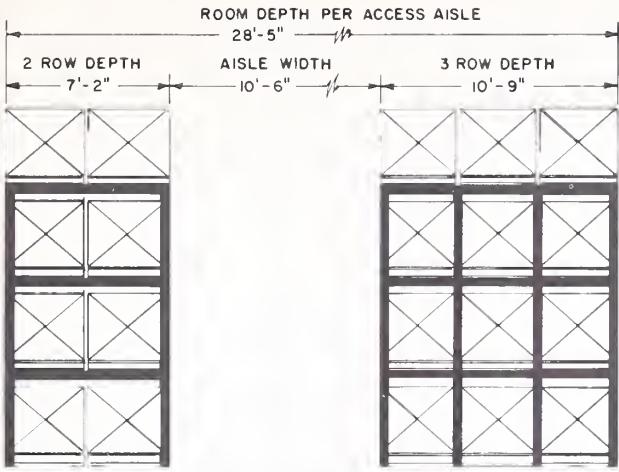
Basic dimensions for four-tiered drive-in pallet racks.
